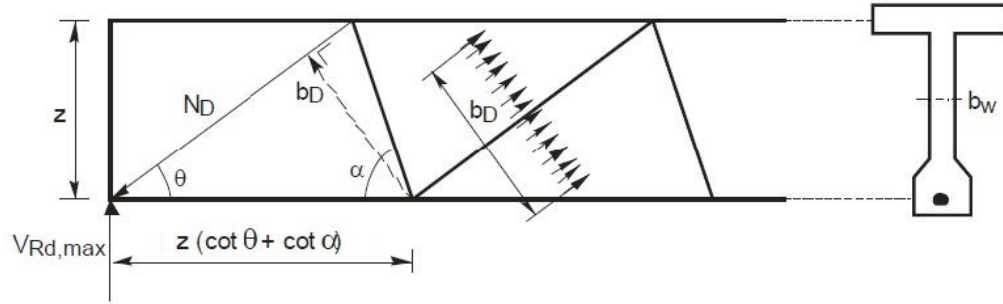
Geometry of the truss model for the compressive strut [5]
